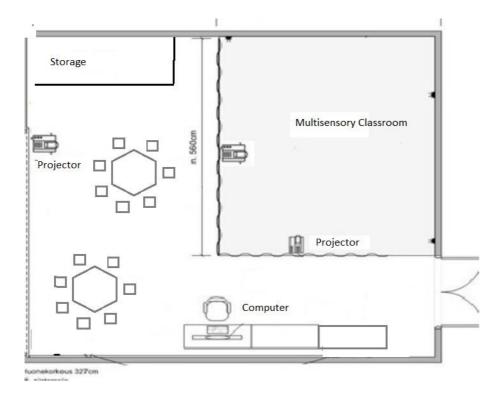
The floor plan of the permanent Multisensory Space/Room at Laurea UAS. Picture credit: Satu Taipale and Minttu Räty.
